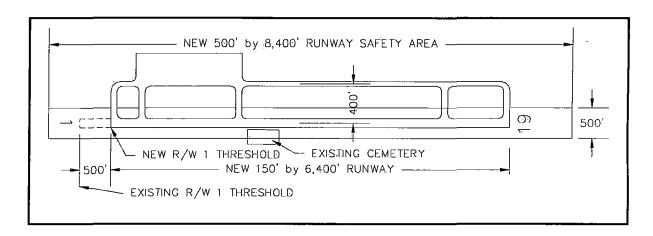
; ALTERNATIVE C-1 - PLAN VIEW LAYOUT
